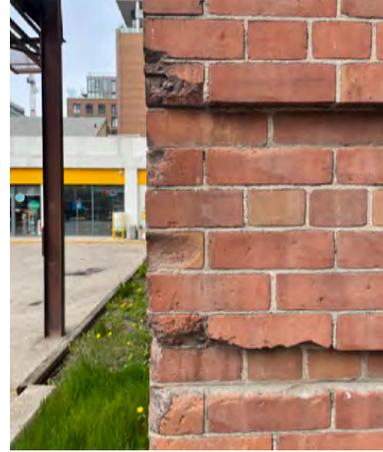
The quoining edge on the east elevation displaying spalling and chipping (ERA, 2022).
